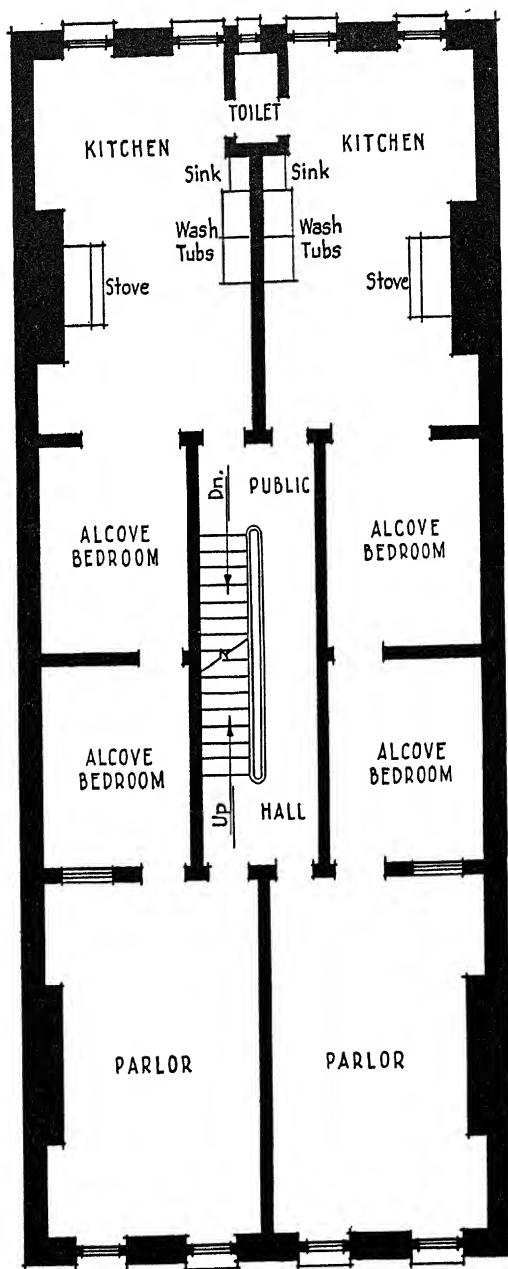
FLOOR PLAN, TYPICAL "RAILROAD FLAT"
